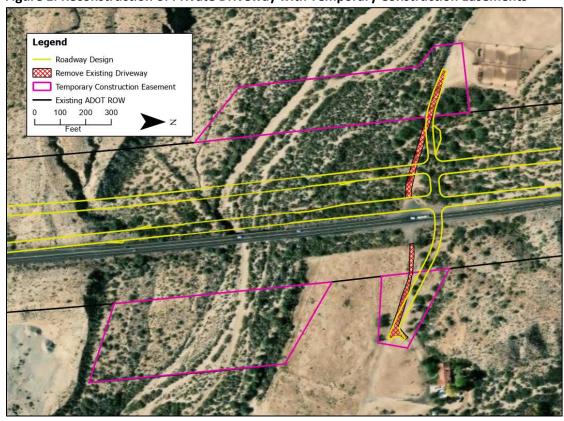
Reconstruction of Private Driveway with Temporary Construction Easements
